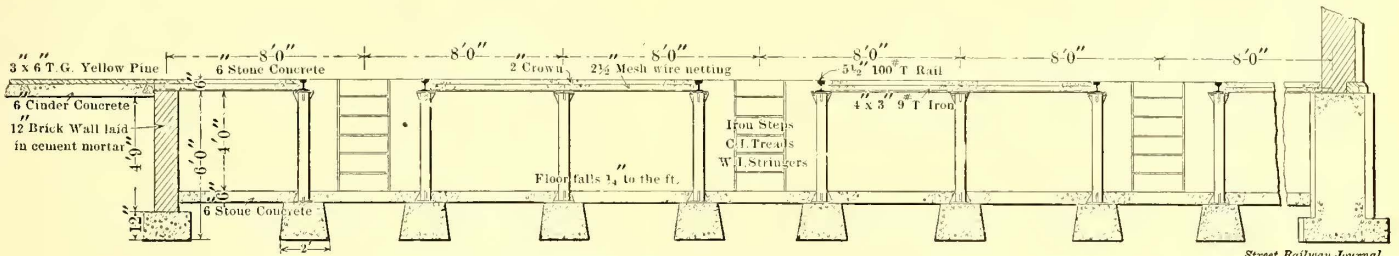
PIT CONSTRUCTION OF IRON AND CONCRETE
